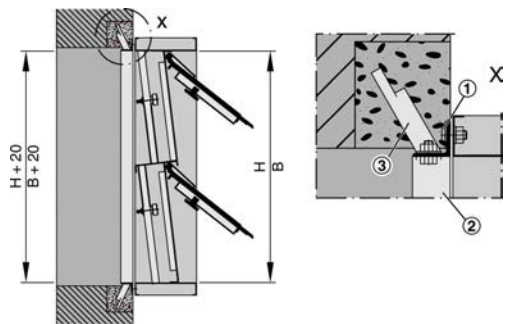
Wall installation with installation subframe (steel/stainless steel construction)
